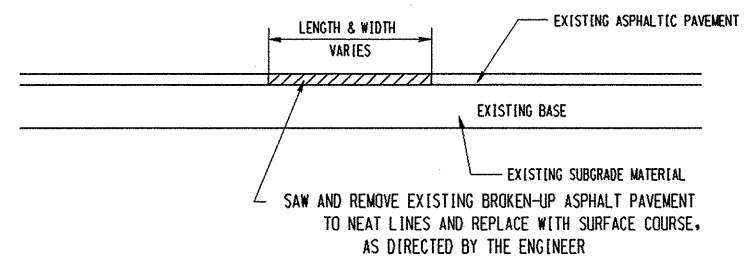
DETAILS OF REPAIRING EXISTING PAVEMENT PRIOR TO RESURFACING FOR FULL DEPTH AND MILLING
